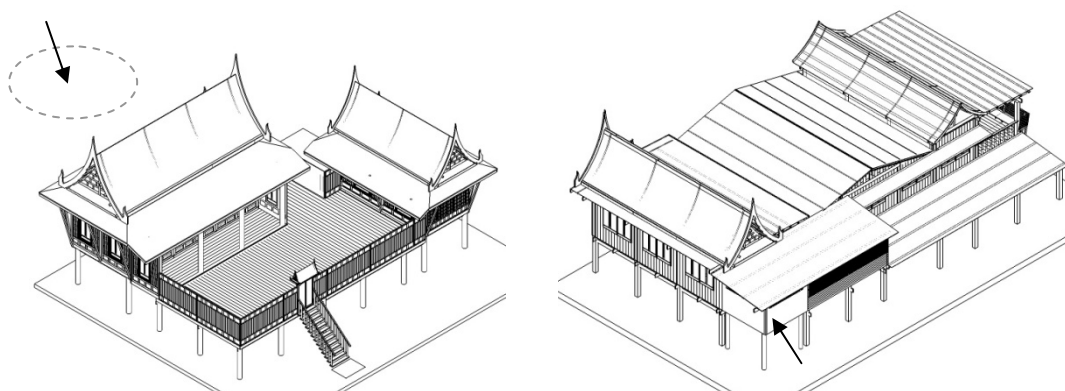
A porch with a *lean-to* roof, a bench and a stair
